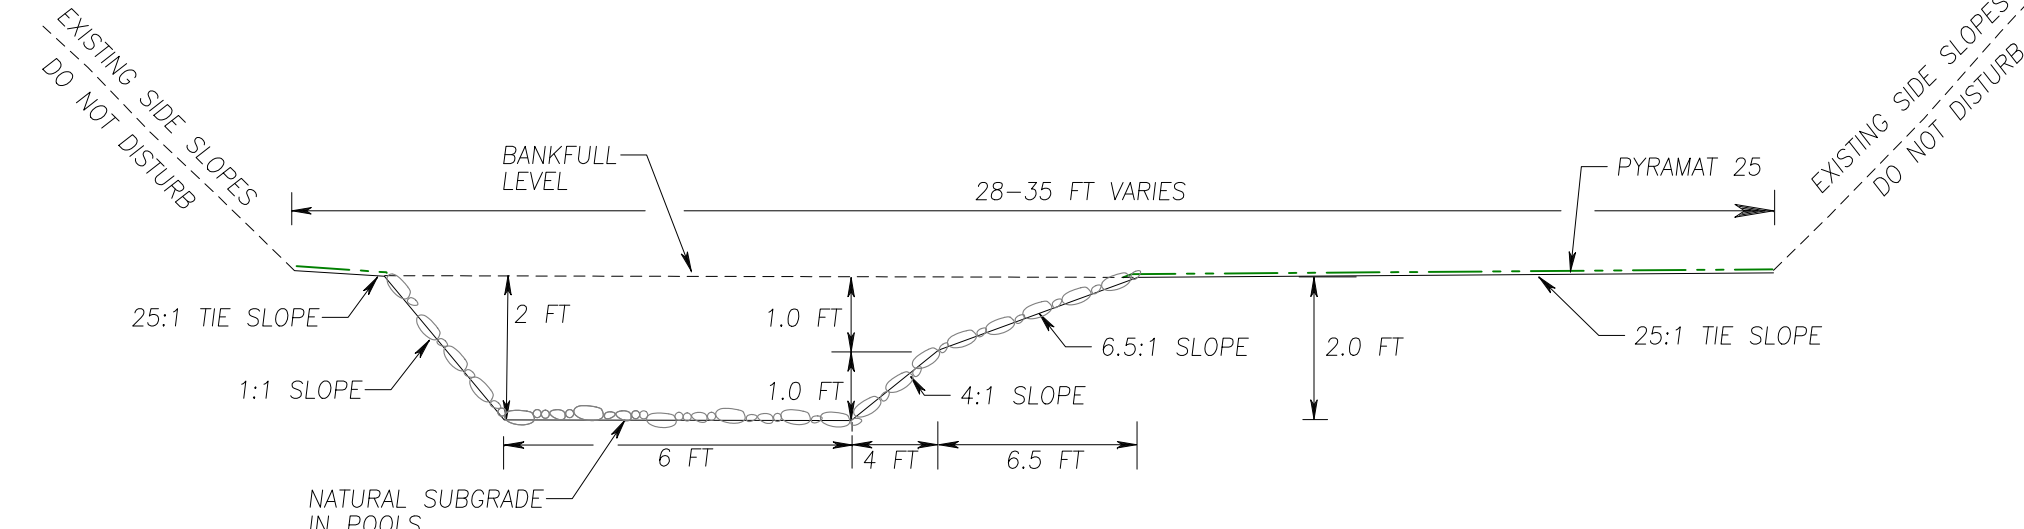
RIFFLE SUBSTRATE INSTALLATION SECTION VIEW
